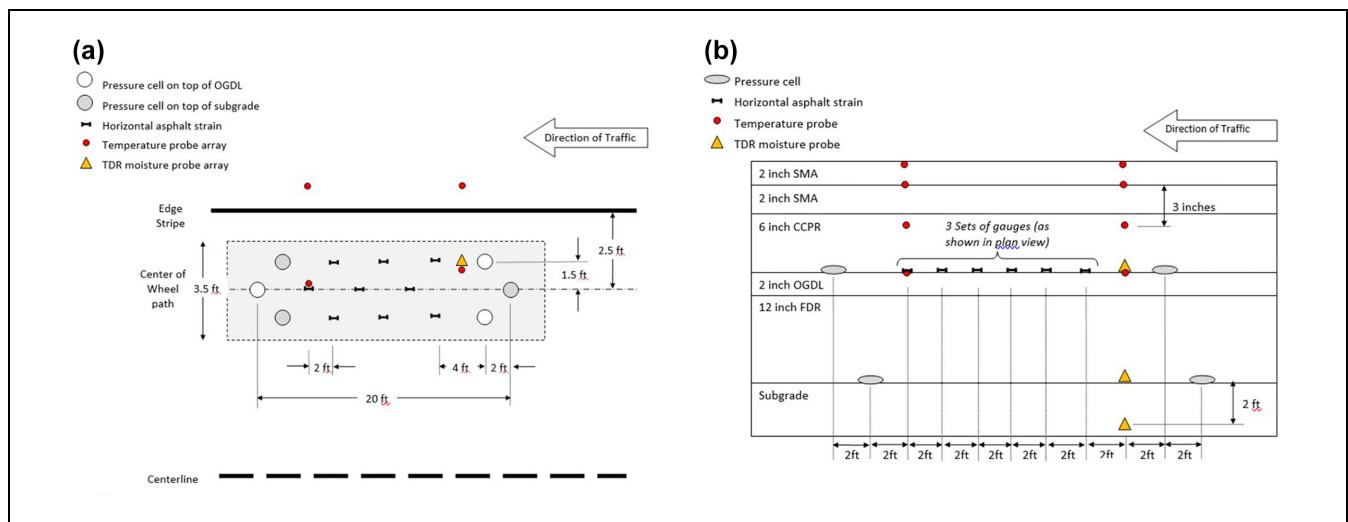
Instrumentation layout: (a) plan view and (b) profile view.
